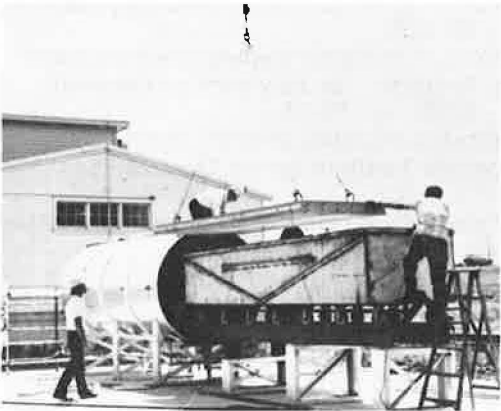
Load test set up for polymer-impregnated concrete bridge deck panel.
